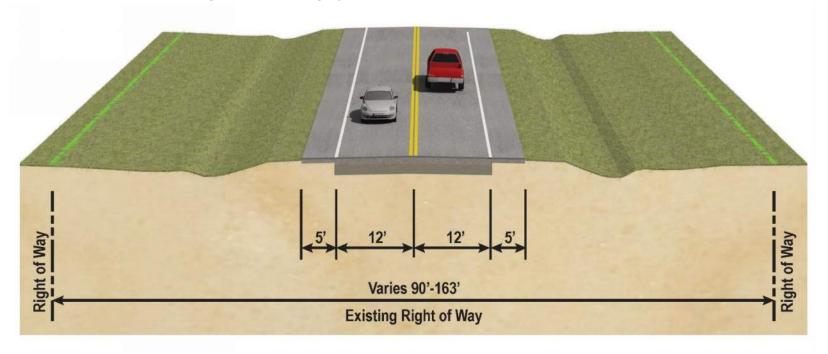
Existing Typical Section – Avenue Y to La Vista Drive
